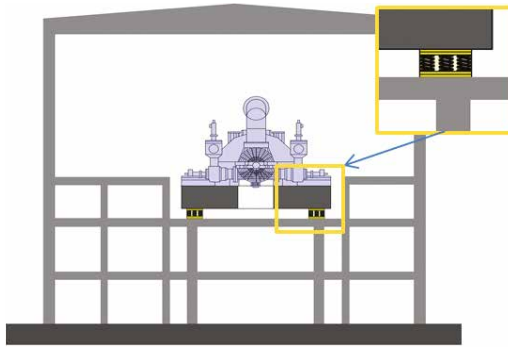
Spring-supported STG tabletop integrated in a machine building
